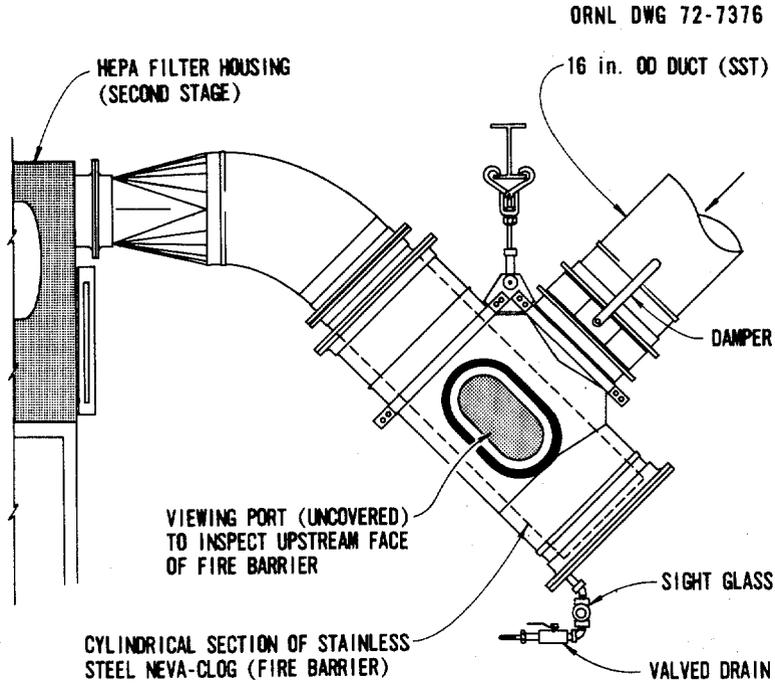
Typical Fire Barrier Installation Upstream of Second-Stage HEPA Filter Housing.
